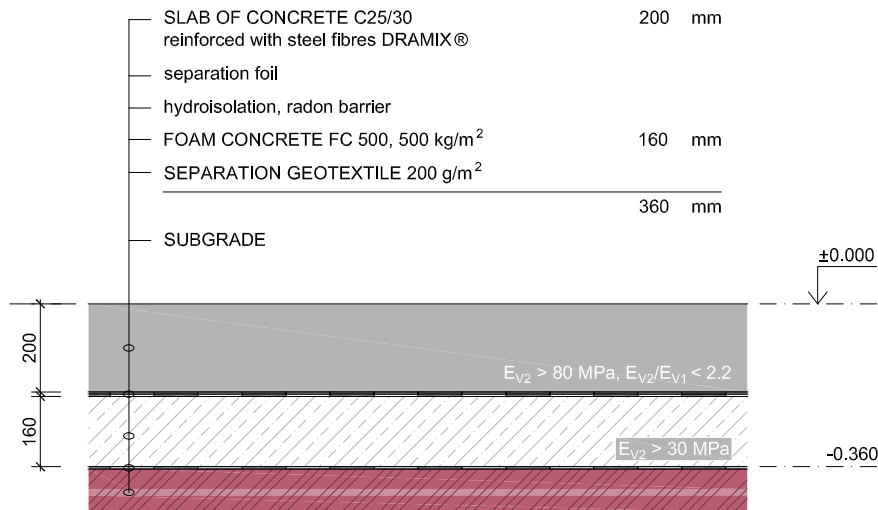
The alternative design of the floor structure I. without the reinforcement of the foam concrete FC 500
